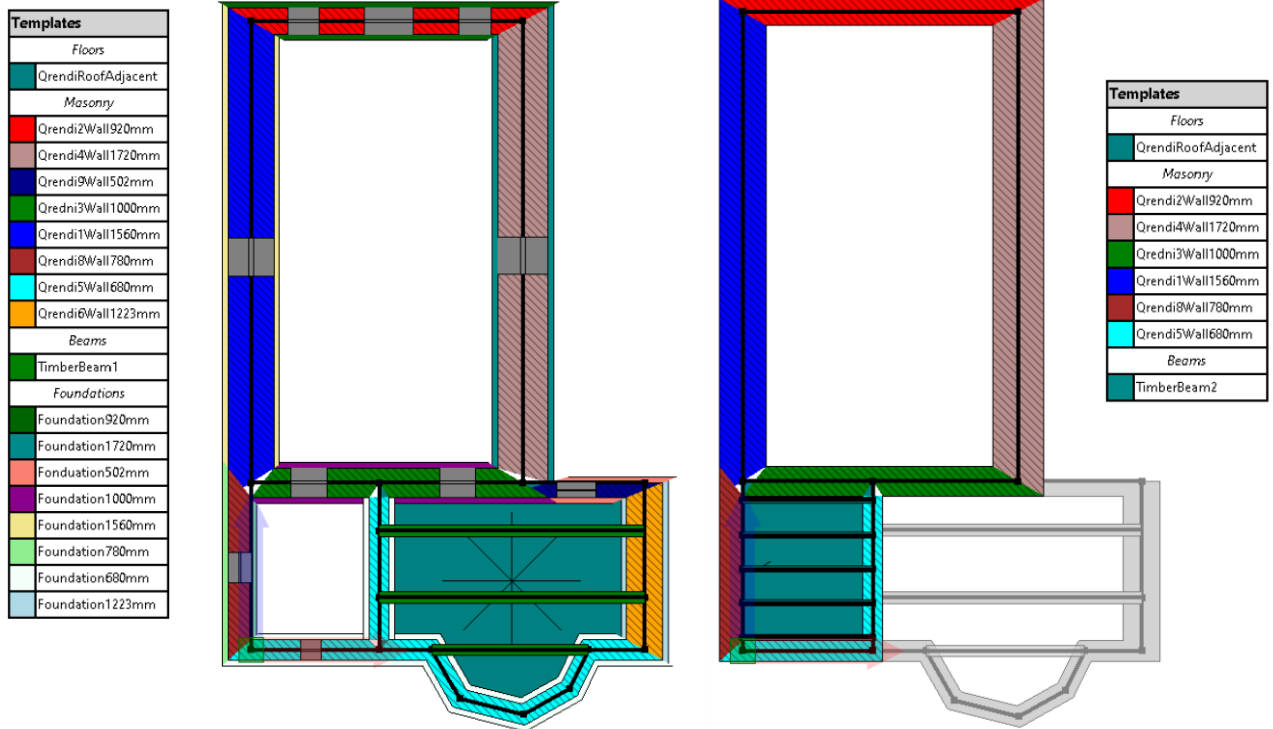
3D Macro Plan from 0 – 3960 mm and 3960 mm – 5200 mm Layout of St Matthew's Chapel in Qrendi.
